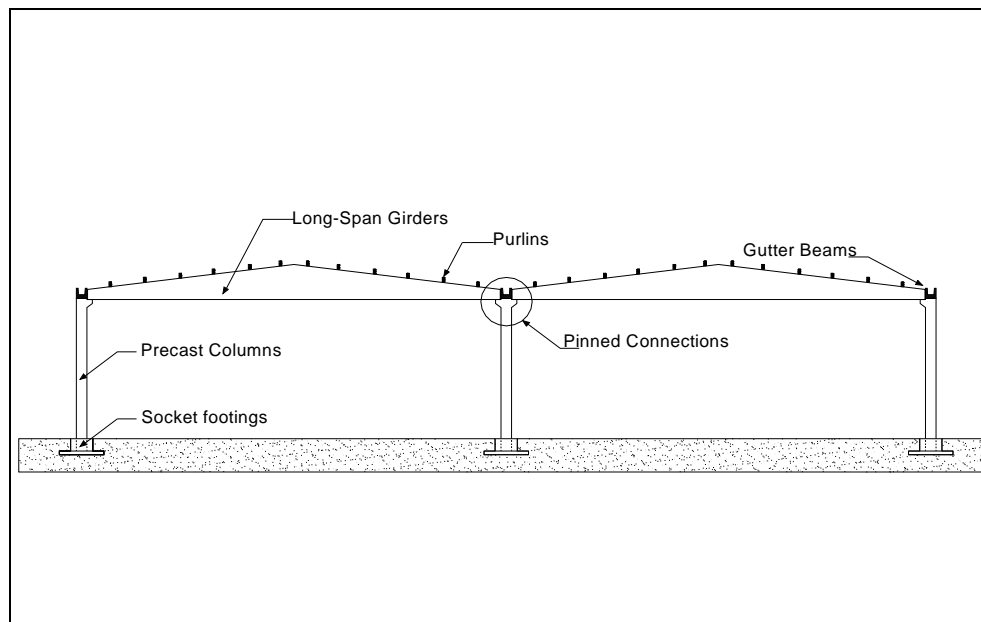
Typical Geometry of the One-story Precast Concrete Building
